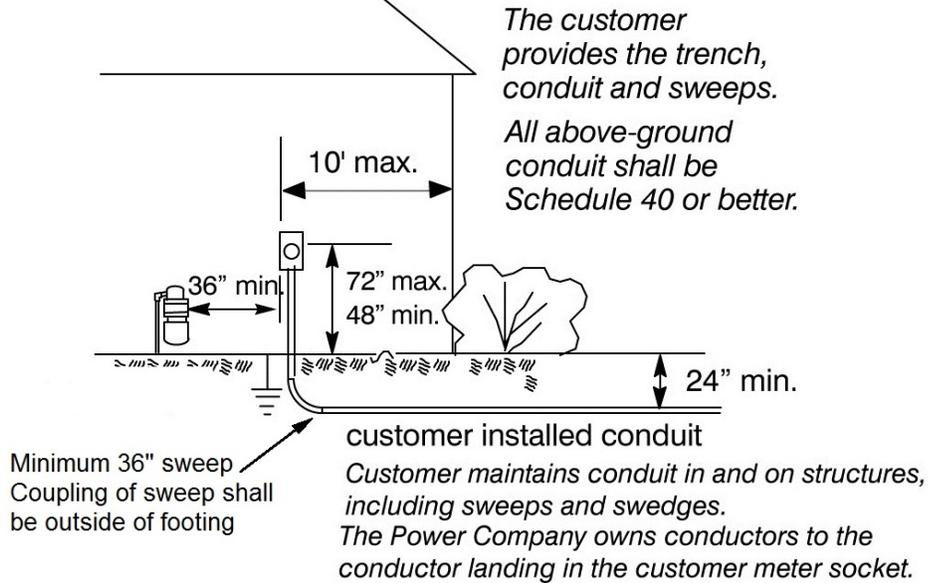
Wall-Mounted Meter Socket Location for Underground Service
